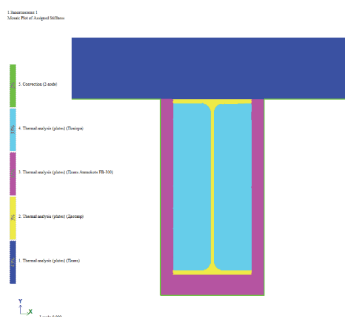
Cross-sectional view of a floor beam with fire protection plates
